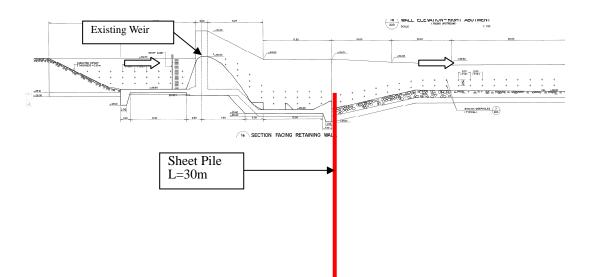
Jaclupan Conversion Weir and new underground wall Section
